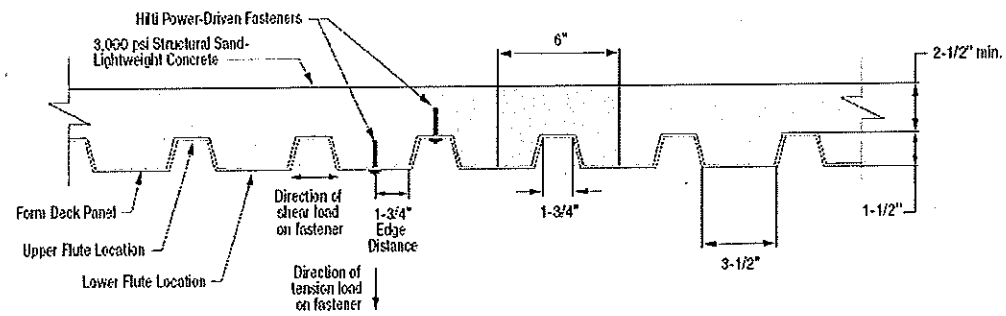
HILTI FASTENER LOCATIONS IN 1 1/2-INCH-DEEP COMPOSITE FLOOR DECK PANEL, INVERTED DECK PANEL PROFILE ORIENTATION
